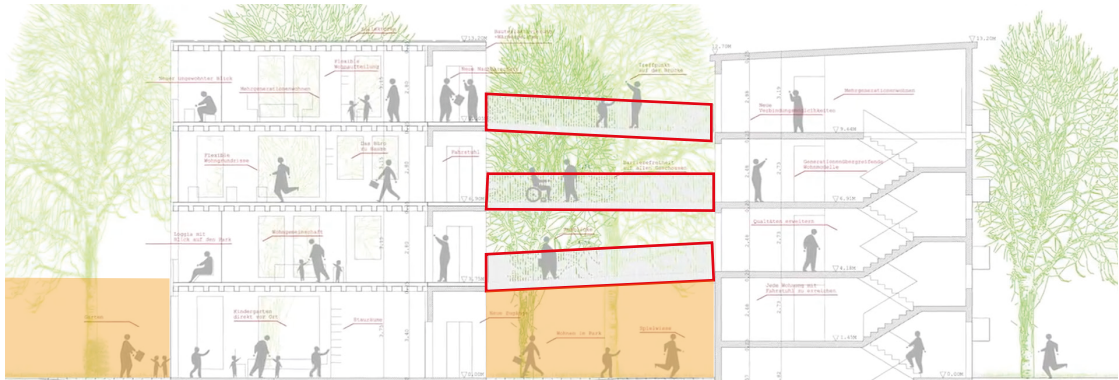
The transition spaces as designed by LIN Architects and the dynamic bridges that connect the new building with its existing context. Drawing by Author (LIN Architects, n.d.)
